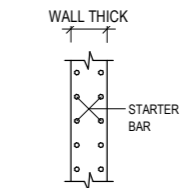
DETAIL OF PEDESTAL FOR COLUMN/ WALL (N.T.S.)
